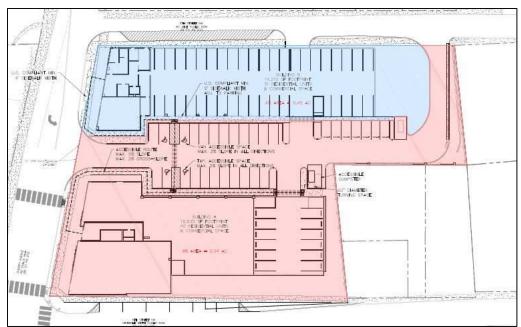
Site Plan, 501-A and 501-B Cherry Avenue
